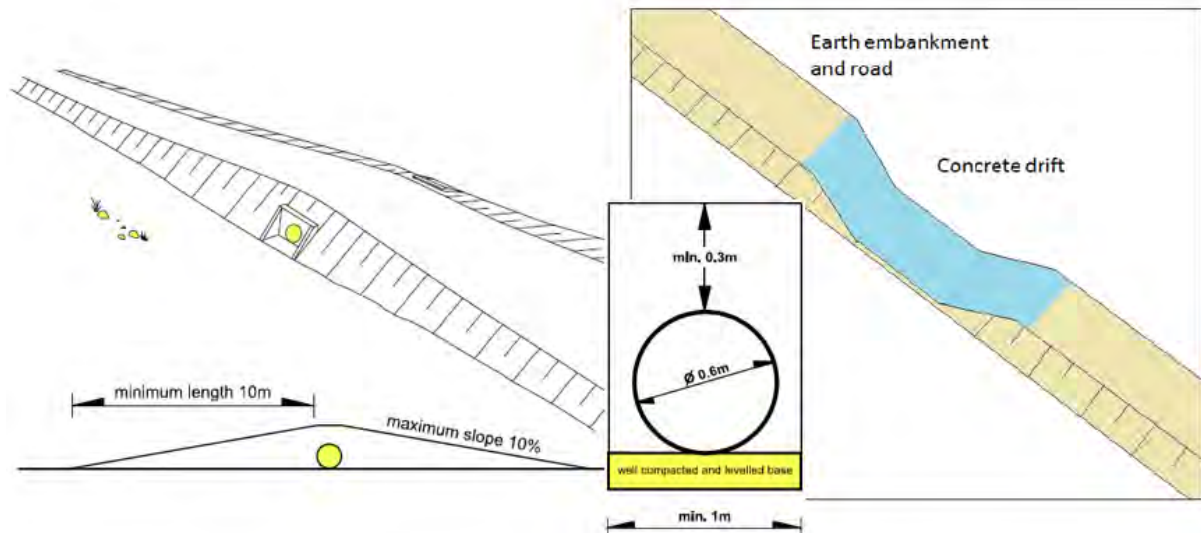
Culverts often have insufficient capacity and are prone to flood damage. Concrete drifts have greater capacity to transfer flood flows over the road
